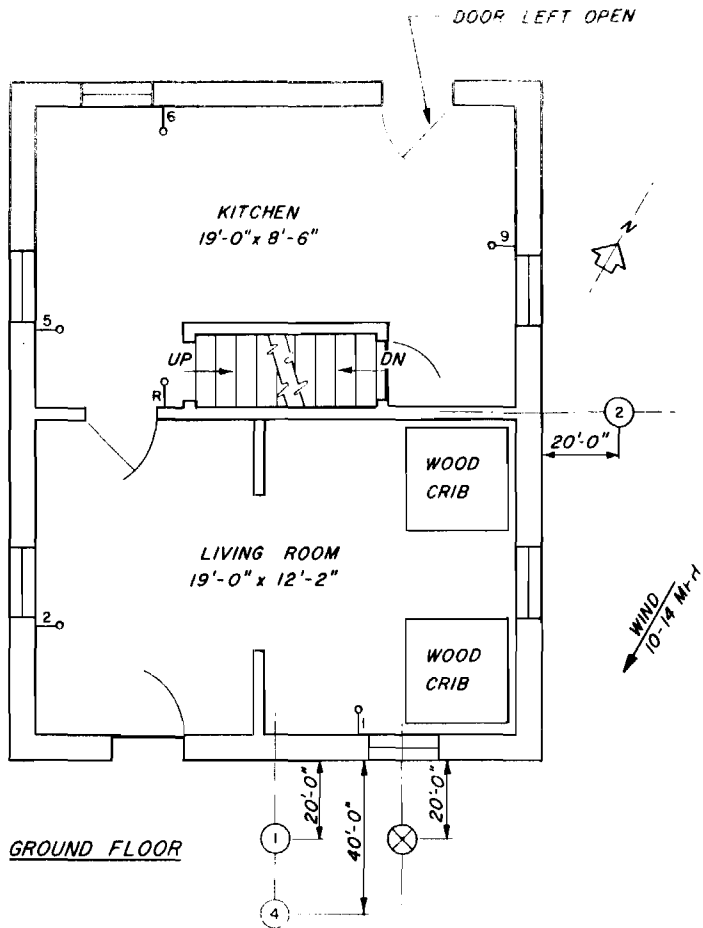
BUILDING No. 4 - TWO - STOREY WOOD FRAME DWELLING WITH CLAPBOARD EXTERIOR AND BRICK INFILLING
